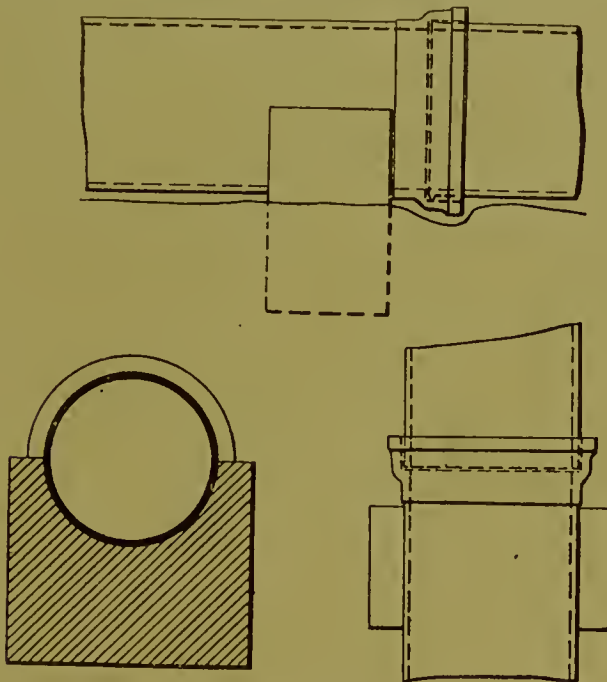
Cast Iron Pipe on Concrete Blocks.
